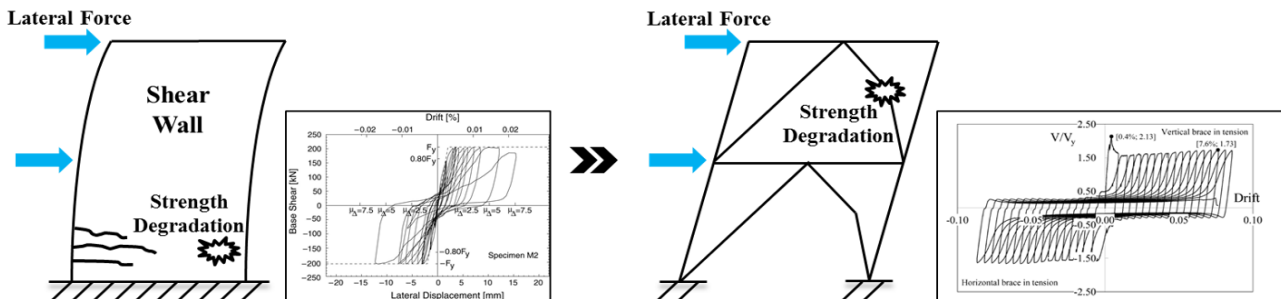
Lateral behavior of concrete shear walls and steel braced frames
